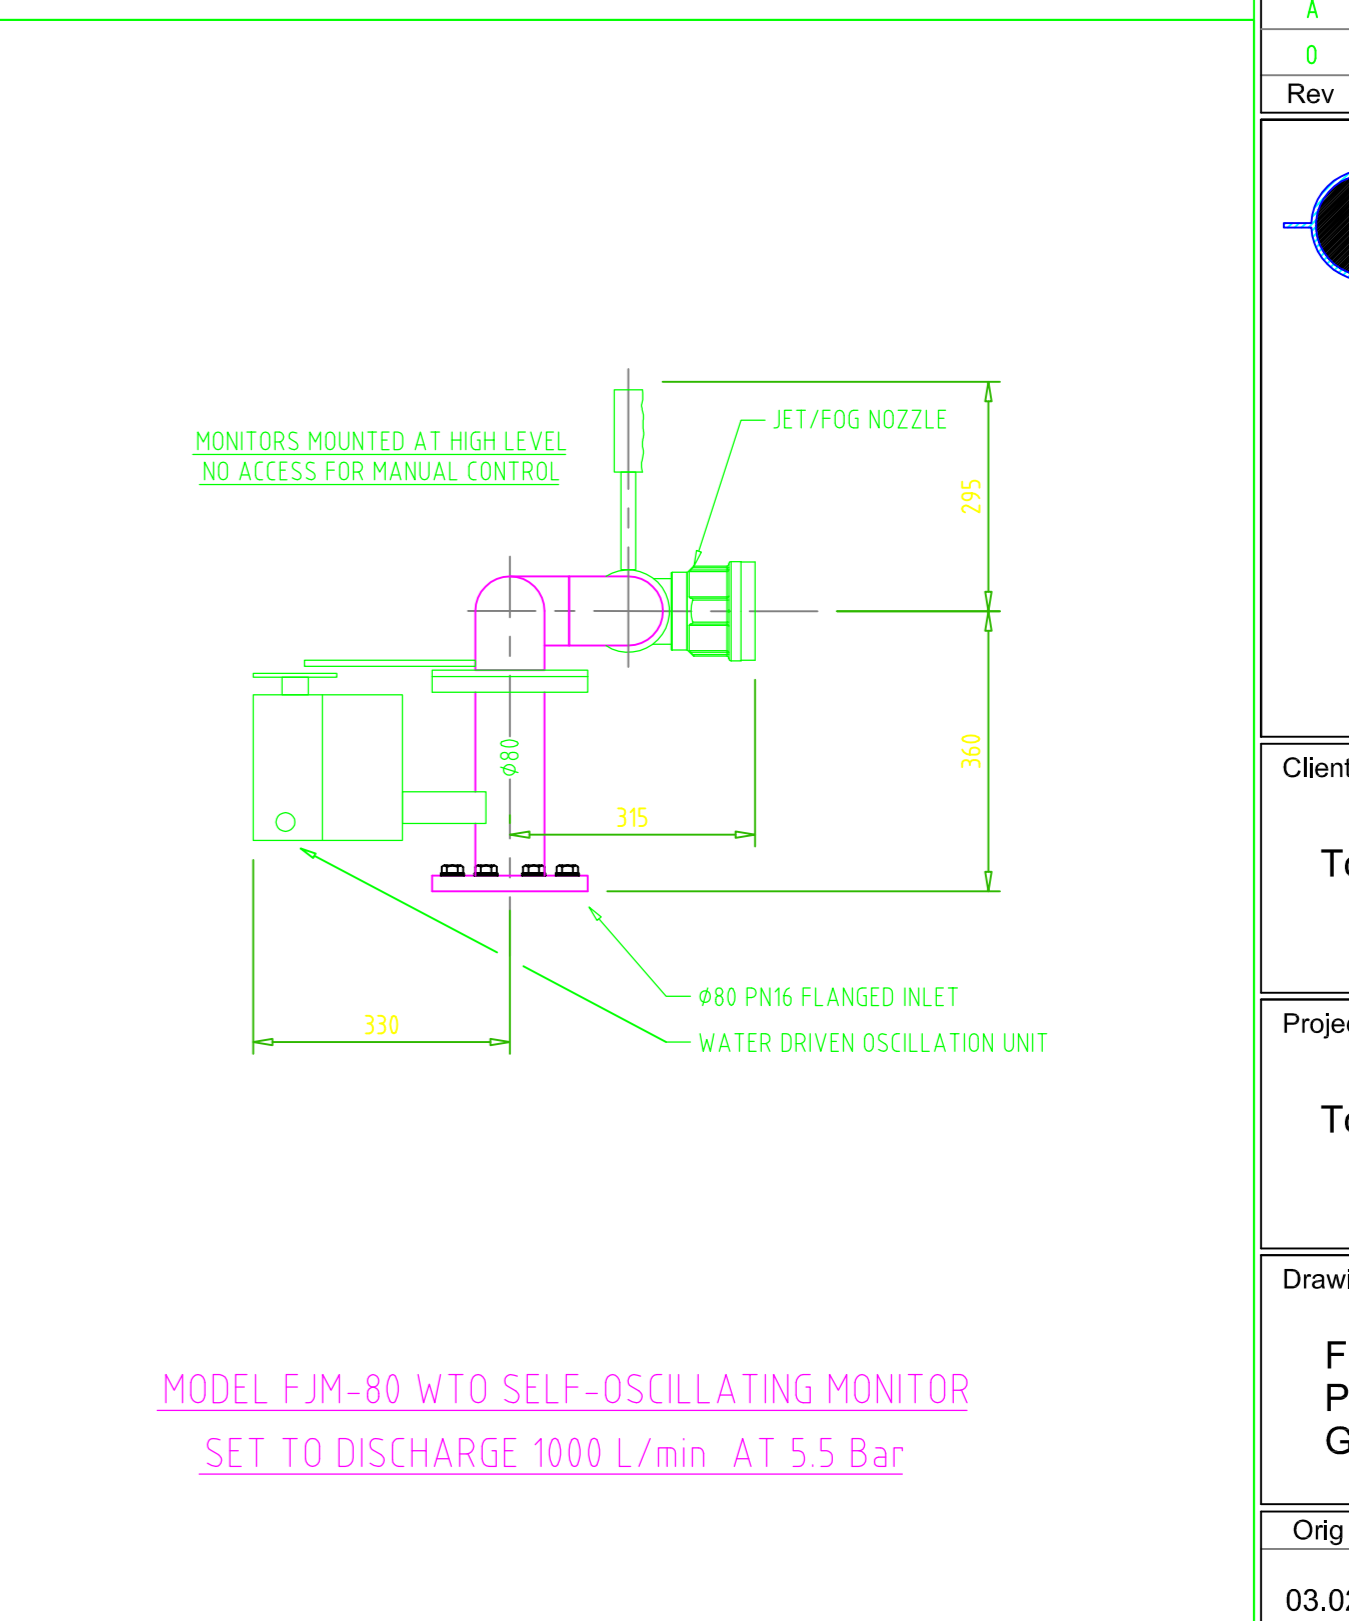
DETAIL OF BLOCK WALL MOUNTED MONITOR No.3
